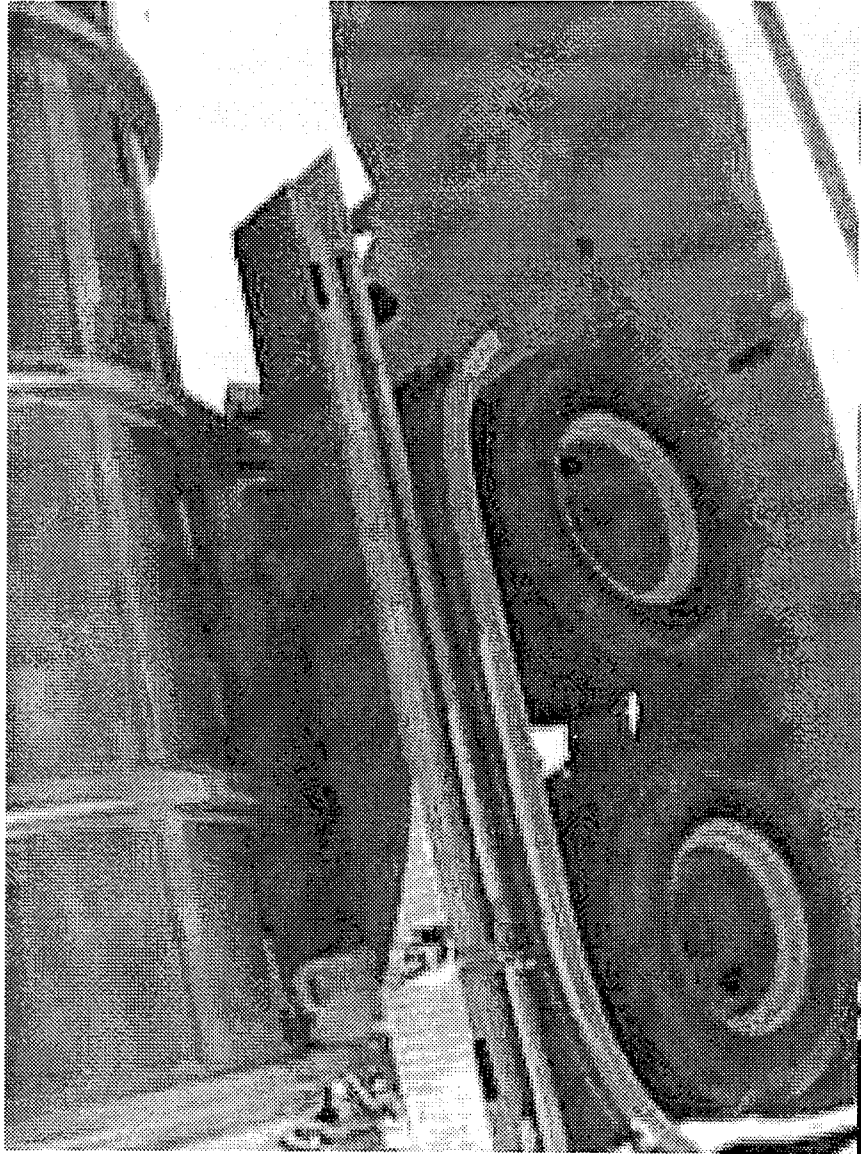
Truck Loading Overlay Pavement and Outside Strain Gauge
